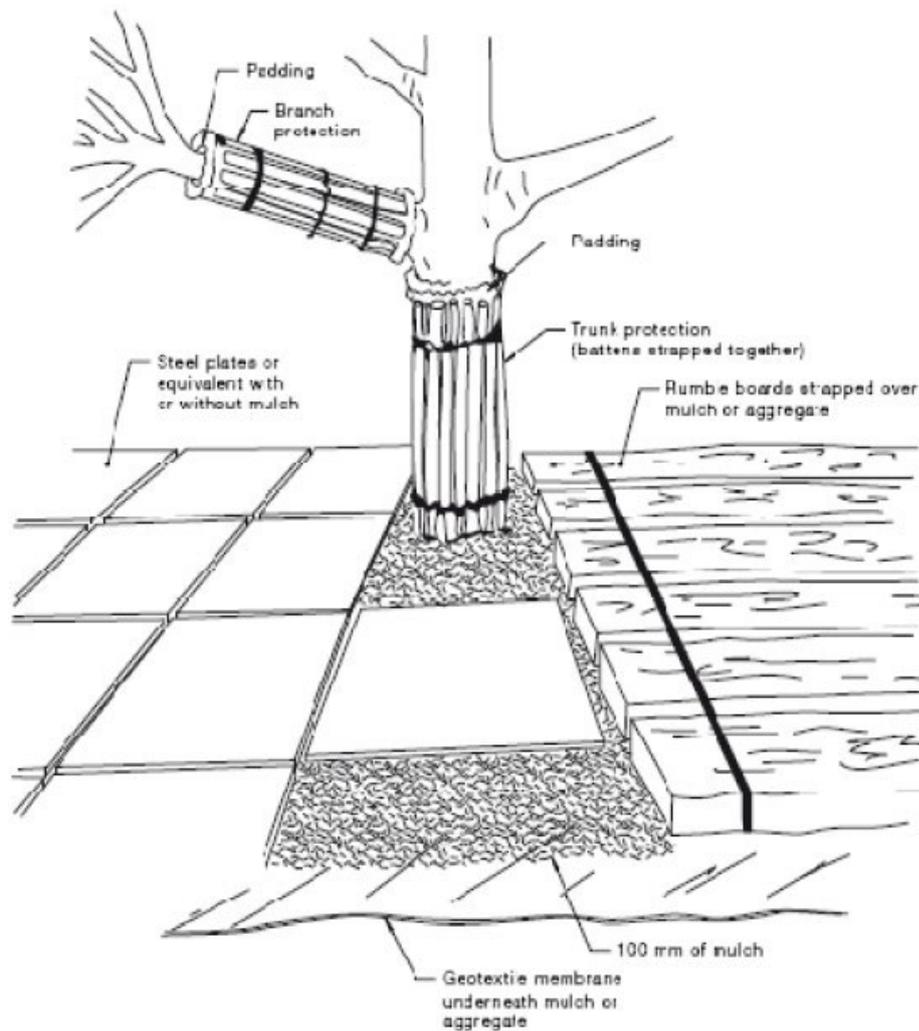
Examples of branch and trunk protection (Australian Standard AS4970-2009)
